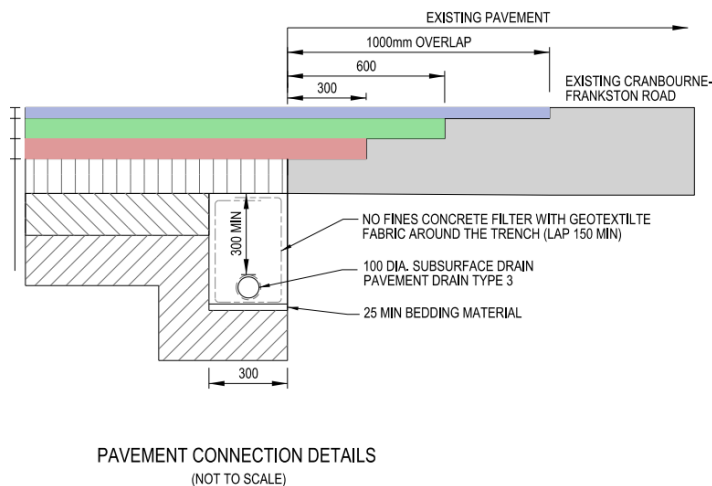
Typical Pavement Connection Detail for interface with ex. pavement
